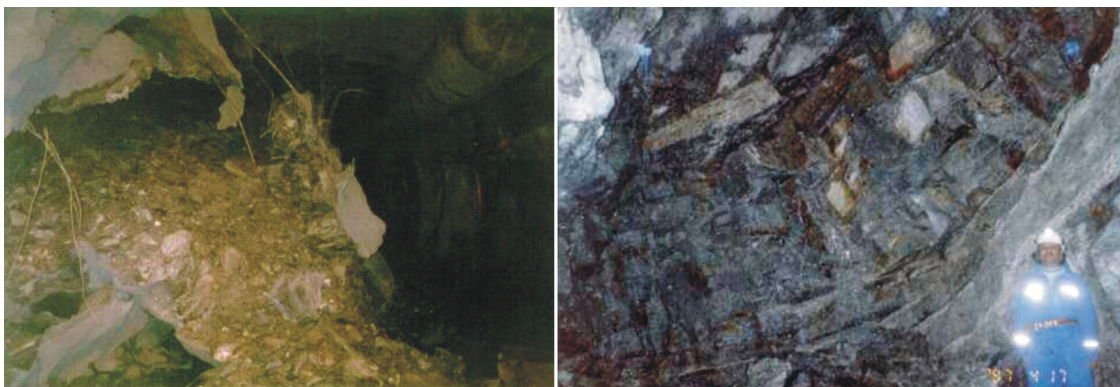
Tunnel instability situations; tunnel collapse after application of tunnel support (left) and open and permeable joints within gneiss (right).
